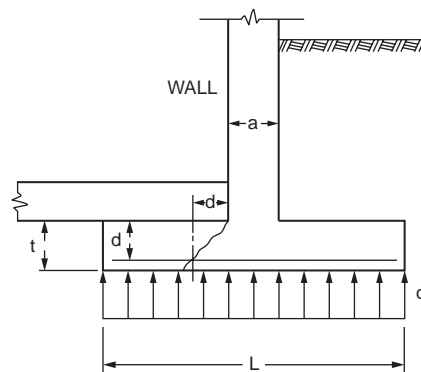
Reinforced-concrete wall footing. (Source: Wang and Salmon, 1985.)
